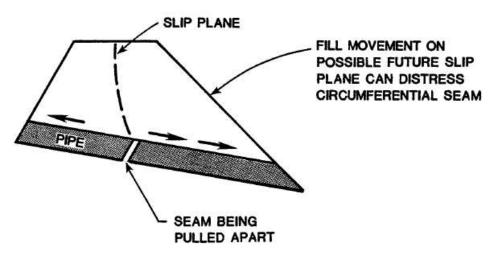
(Exhibit 72) Circumferential Seam Failure Due to Embankment Slippage
